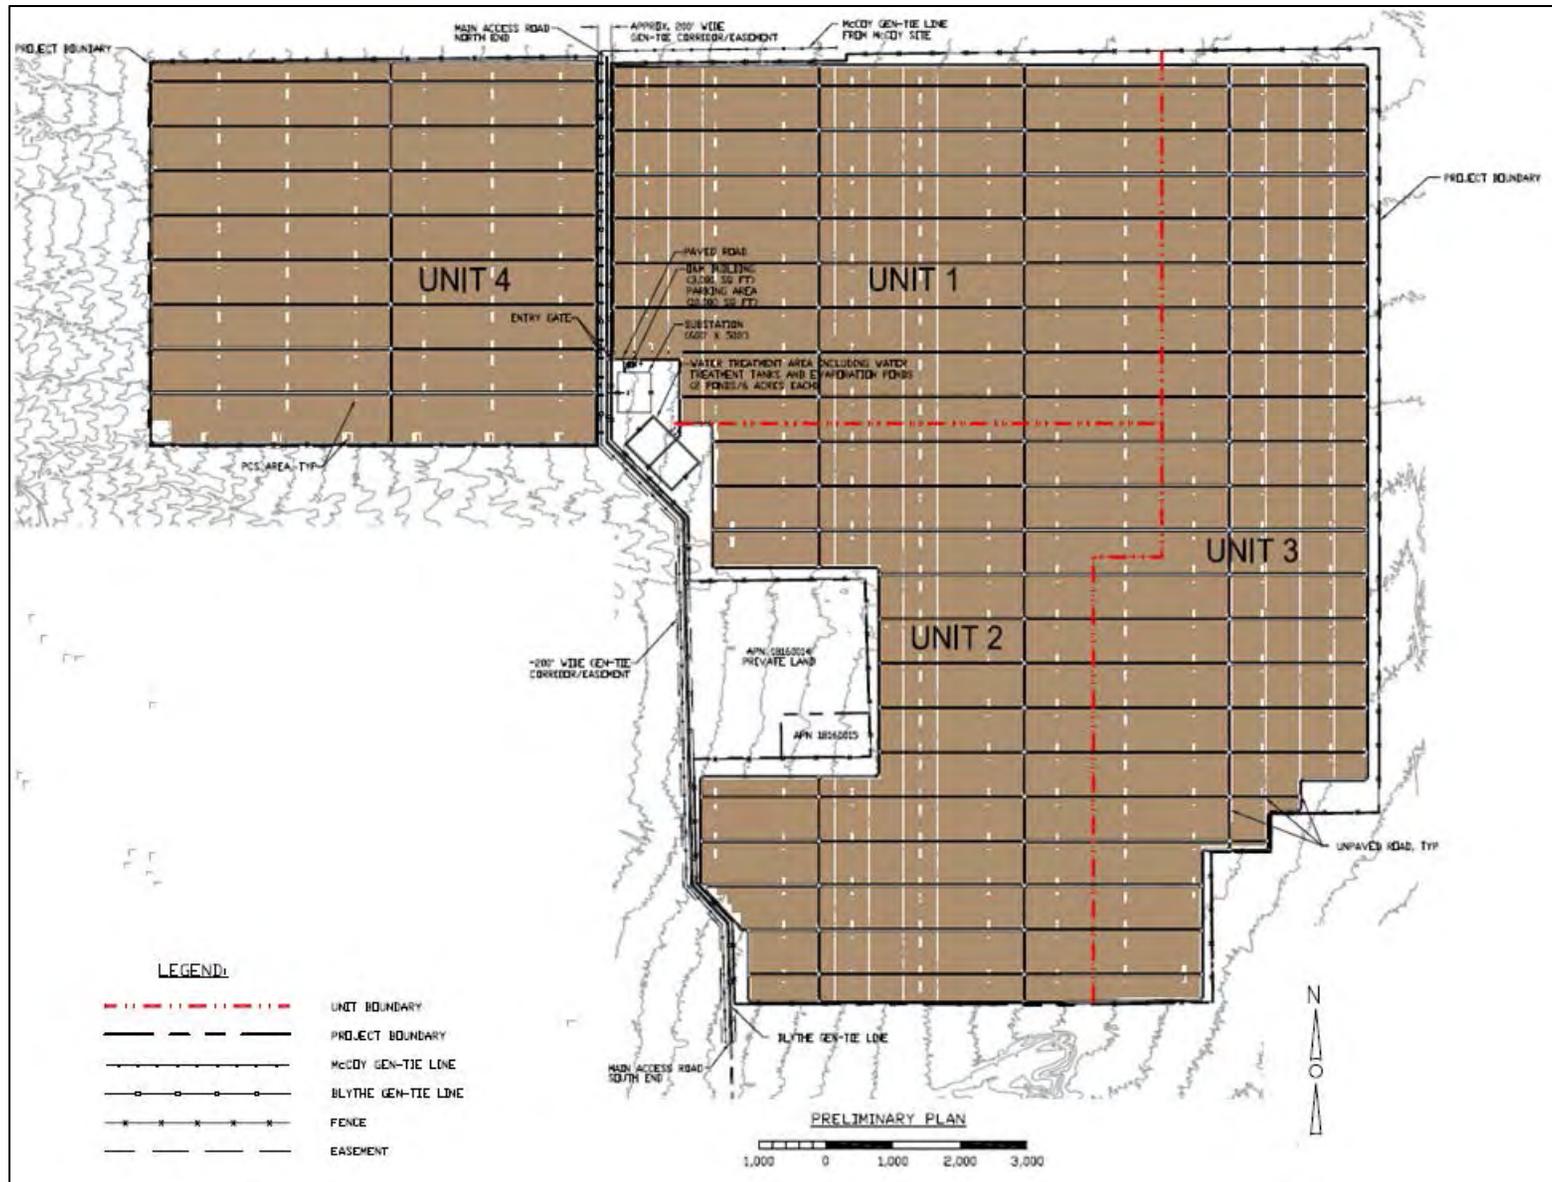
Draft Site Plan Showing Areal Coverage of PV Panels and Other Site Development Features (Source: WorleyParsons)
